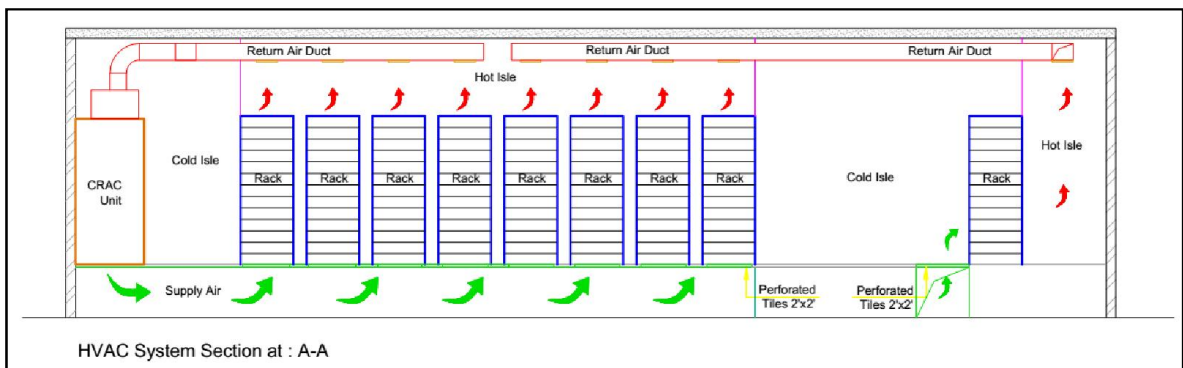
SECS Data Centre Proposed HVAC Layout Plan Section at A-A
